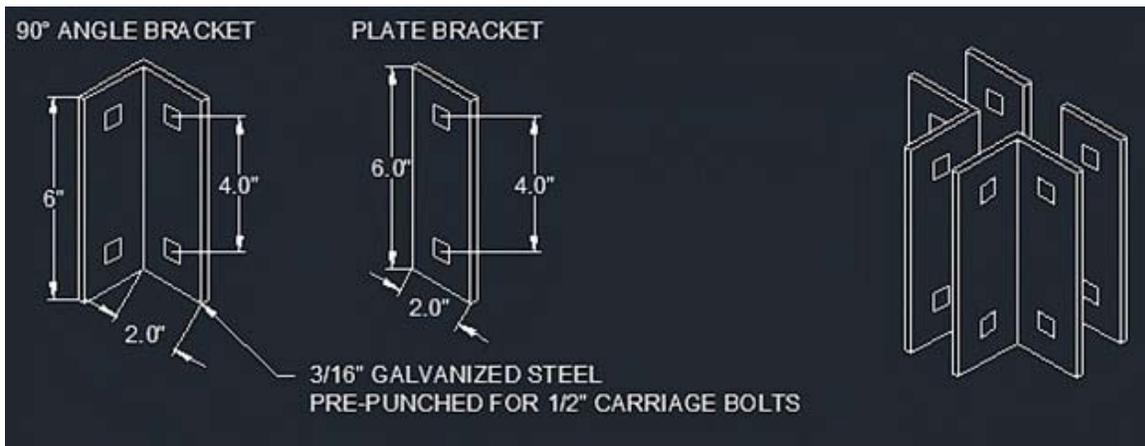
° Angle Bracket and Plate Bracket used to attach joists to dock sub frame
